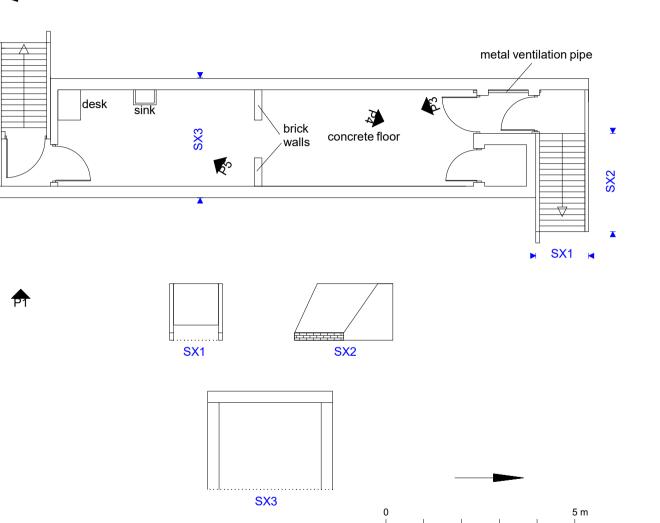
Floor plan and elevations of air-raid shelter. Location and direction of photographs reproduced in text shown.
